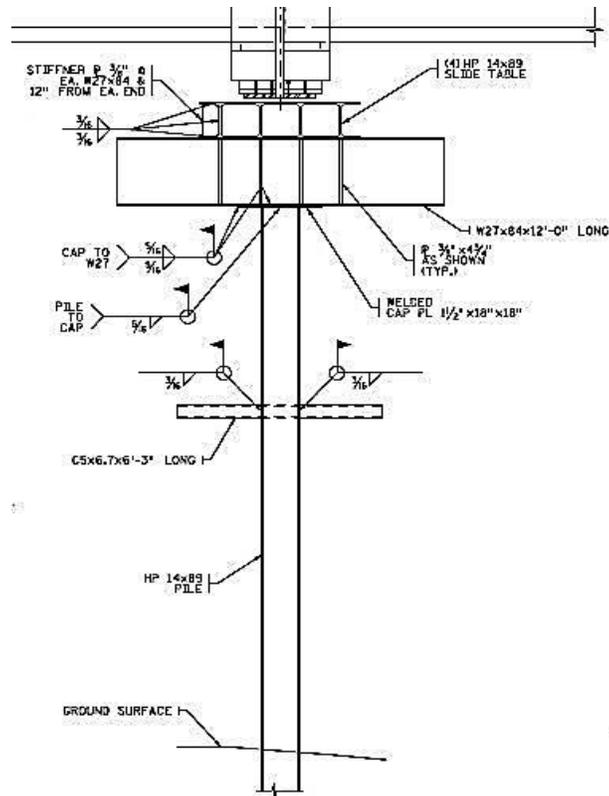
End view of the Larpenteur Ave temporary pier substructure
